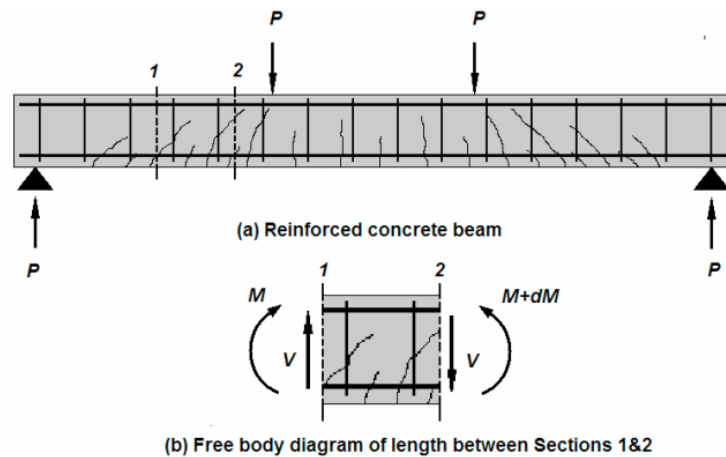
A simply supported reinforced concrete beam (Esfandiari, 1997)
